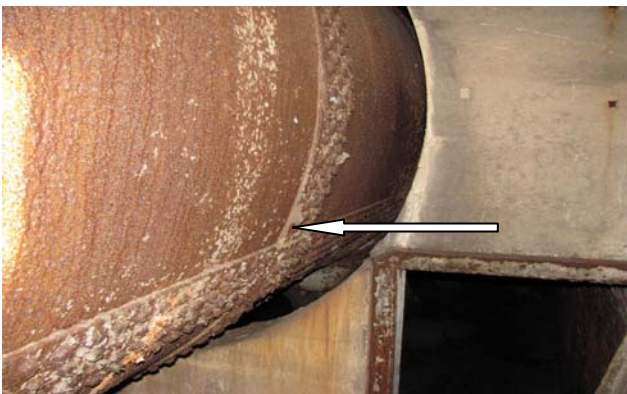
Dark gray coating/paint on 90 inch water main beneath three-hinged steel arched bridge.
